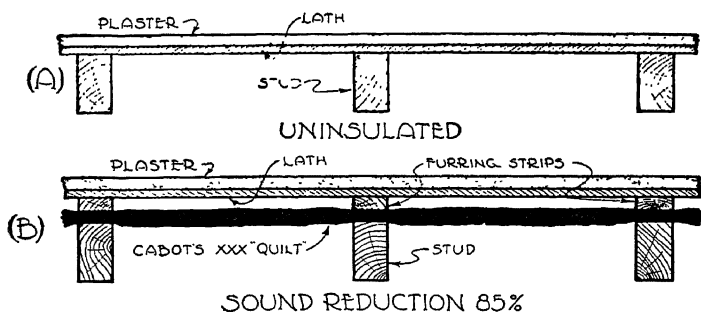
Sections of Wall Showing Application of Quilt Insulation for Sound Reduction
